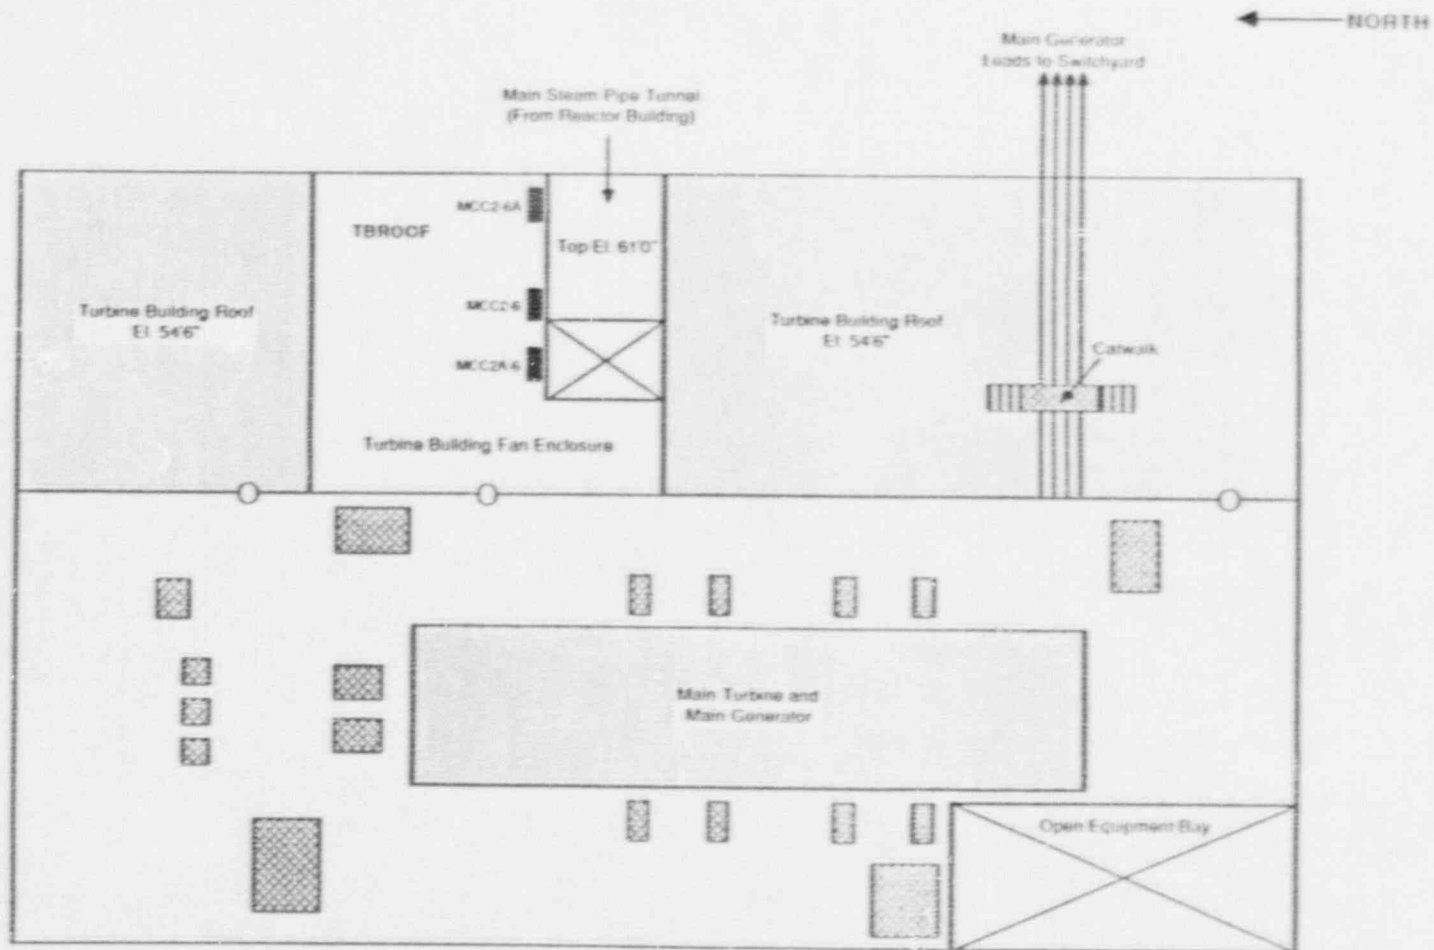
Millstone 1 Turbine Building, Elevation 54'6"
